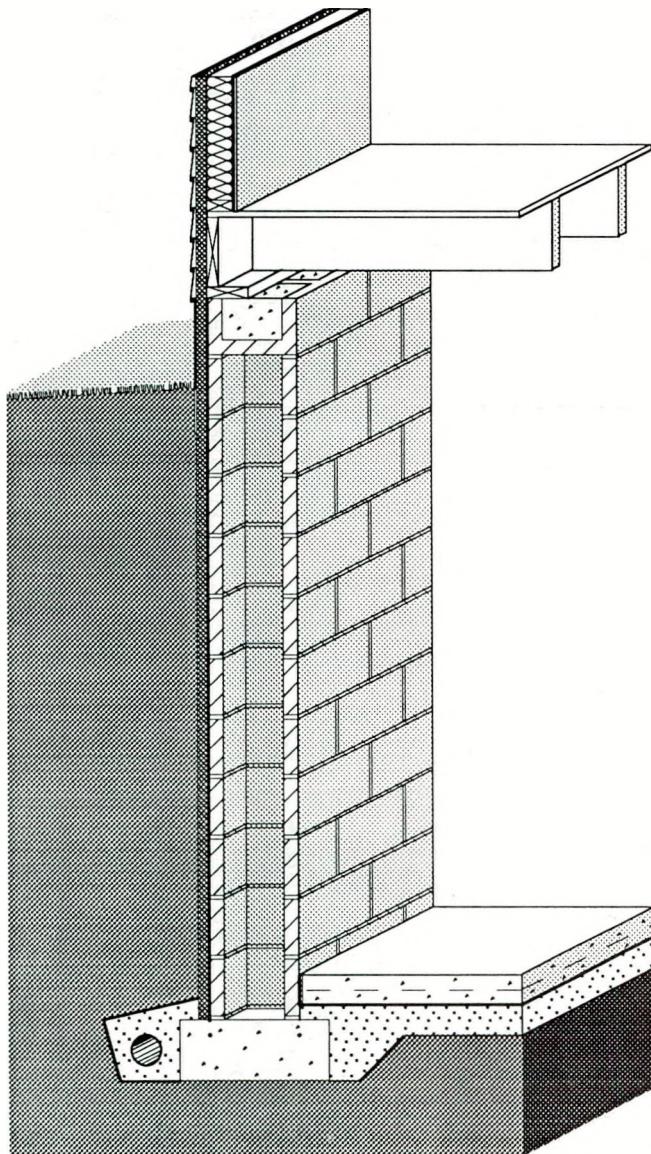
Concrete Masonry Basement Wall with Exterior Insulation
